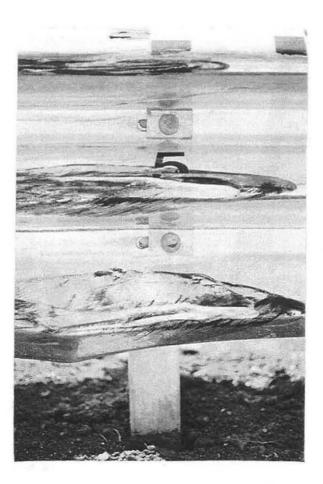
Thrie Beam Damage - Post No. 5, Test MTSS-1
